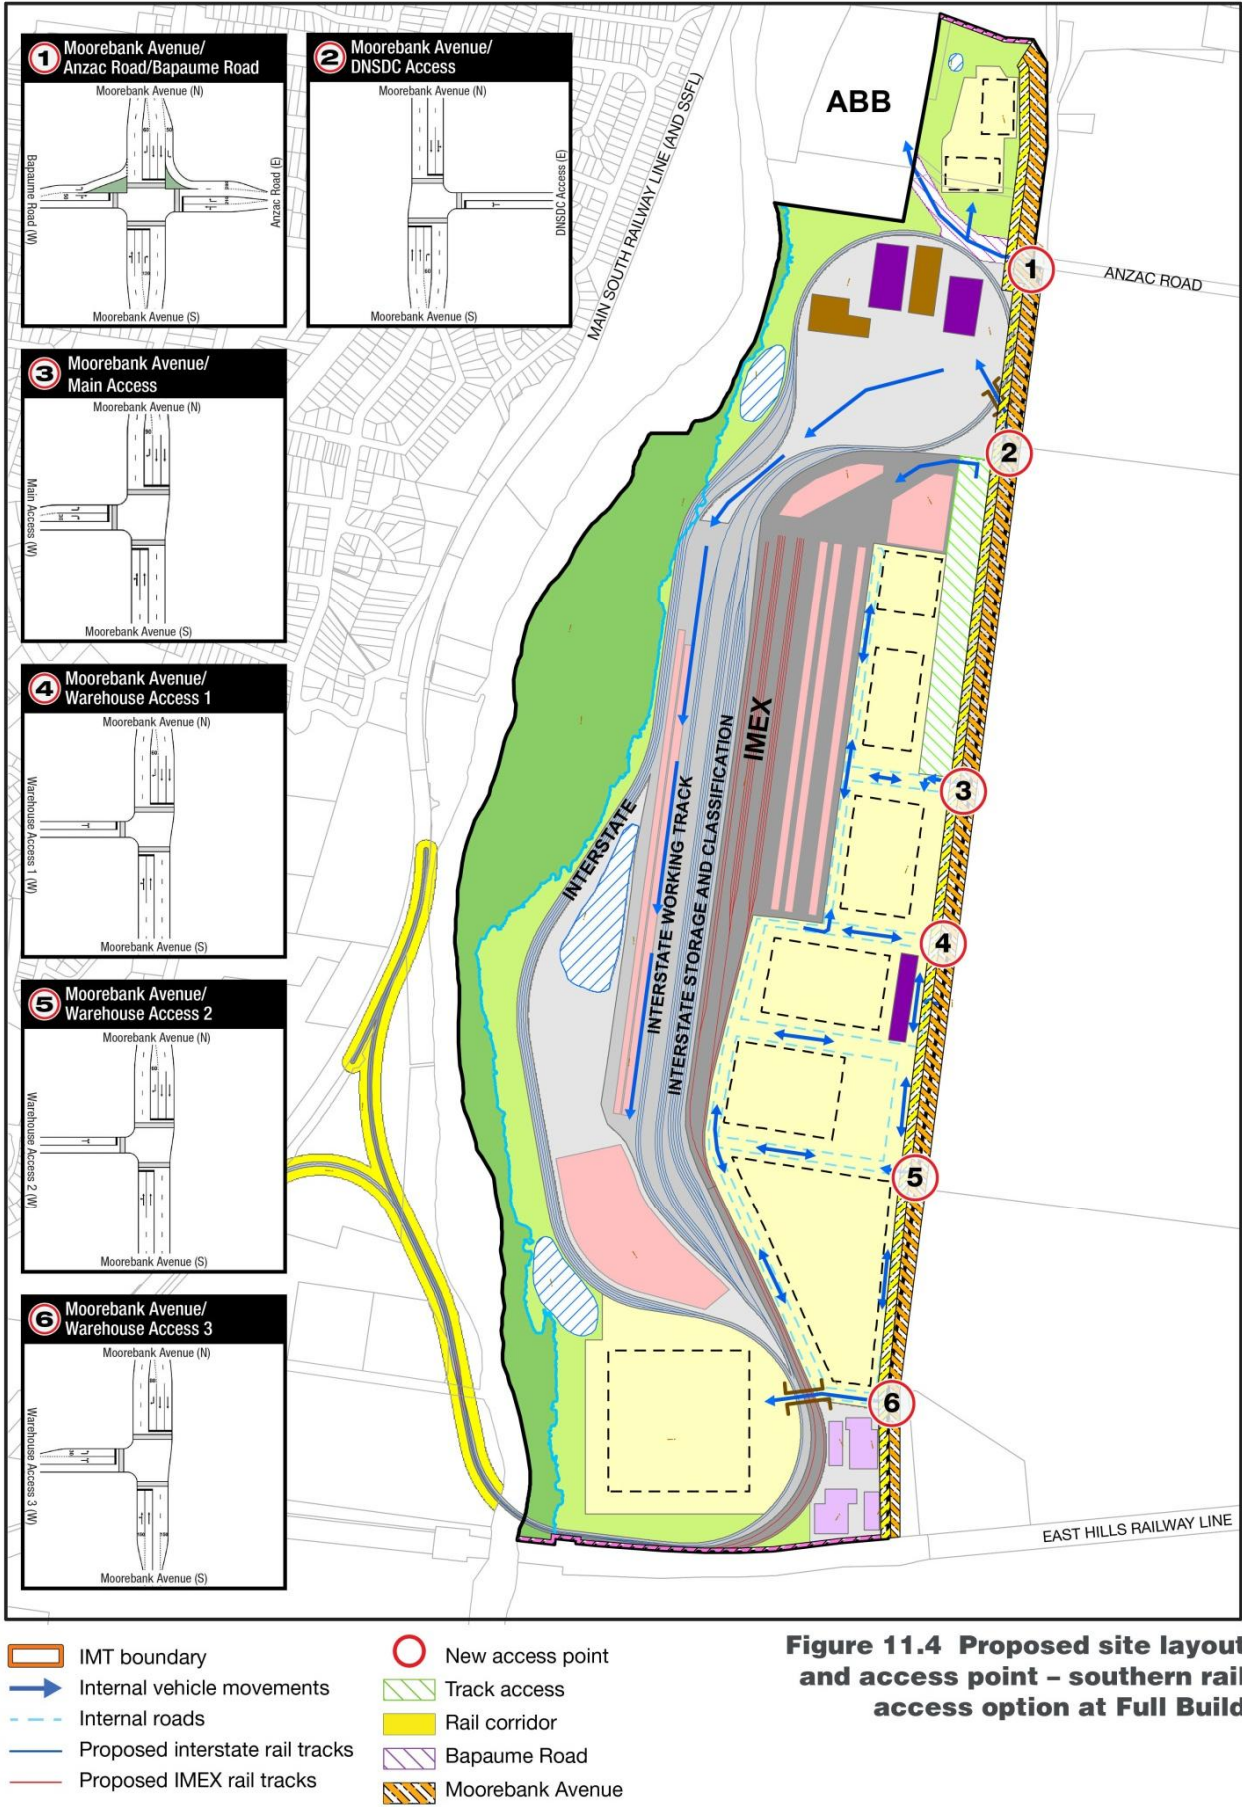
Proposed site layout and access point – southern rail access option at Full Build
